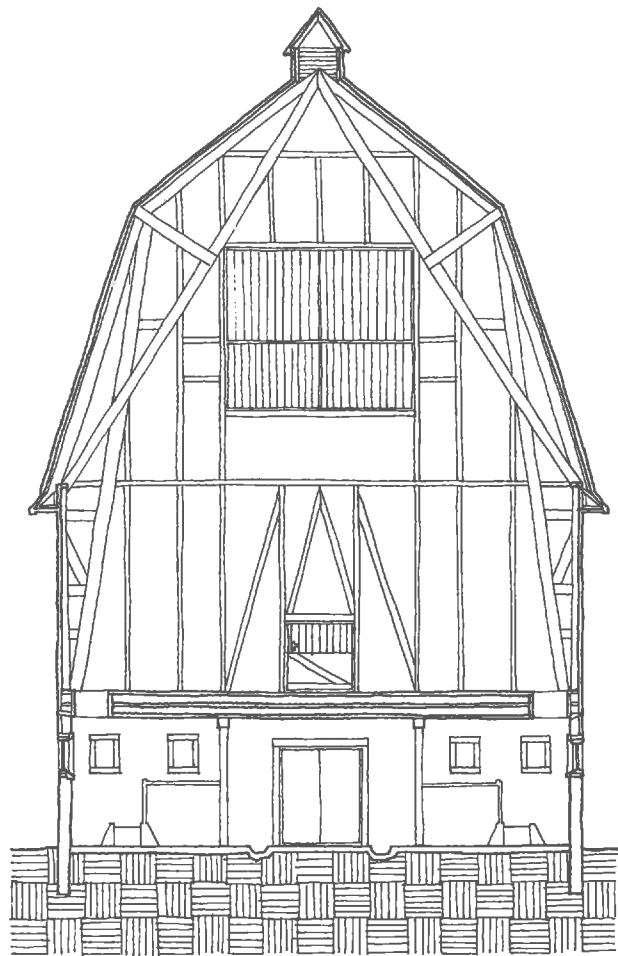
Cross section A-A of the Overwater barn. The loft floor is unnecessarily strong, built of two layers of 40x200s.
